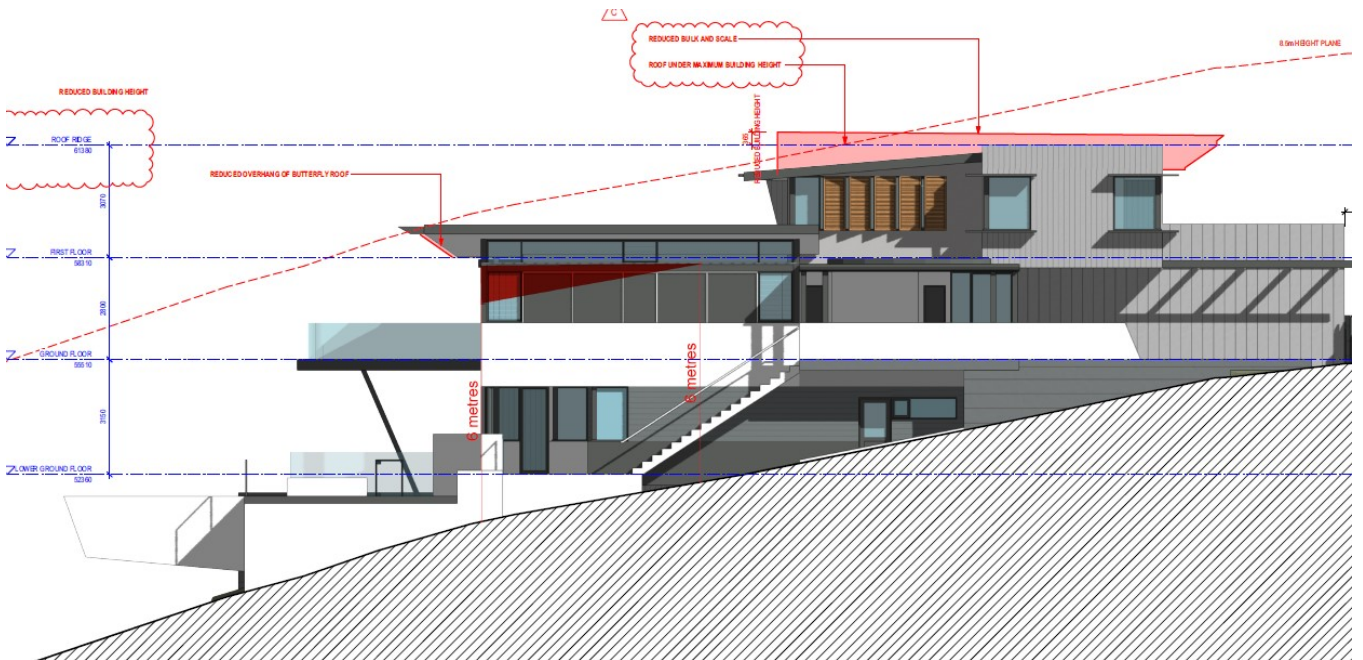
Extent of eastern envelope encroachment shown in dark red.
